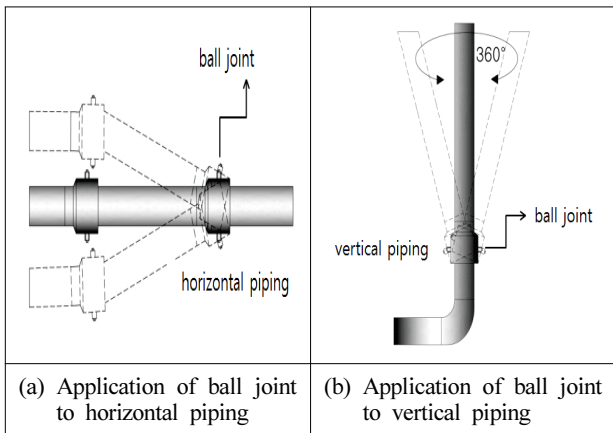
Examples of using ball joints & multi joints<sup>(9)</sup>
